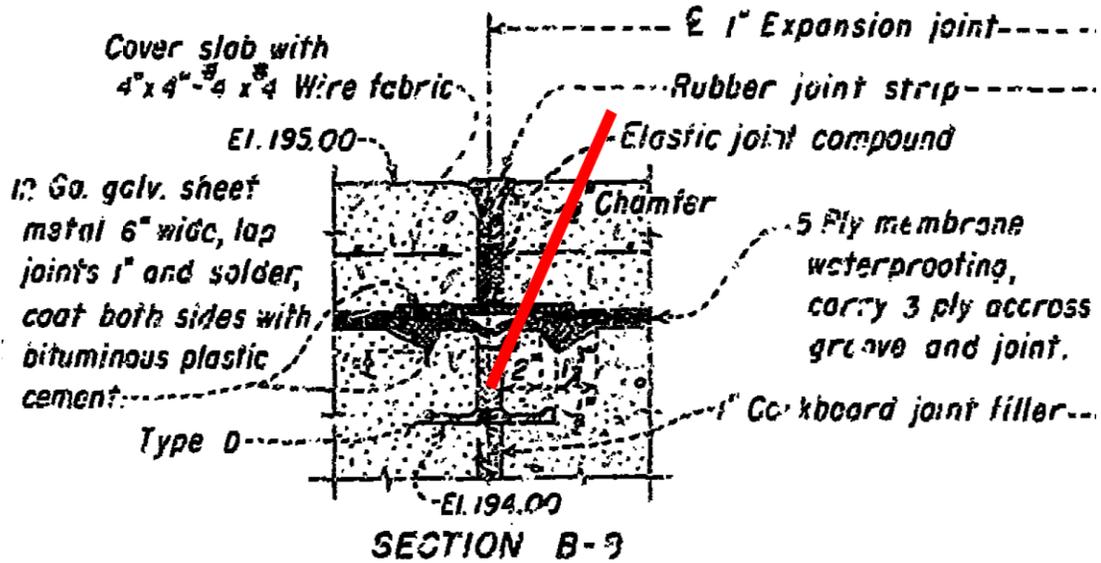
Angled drilling holes as shown on joint detail from drawing 485-D-73 for Folsom Dam.
